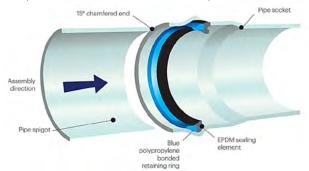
Coss section of joint with Anger-lock™ seal
